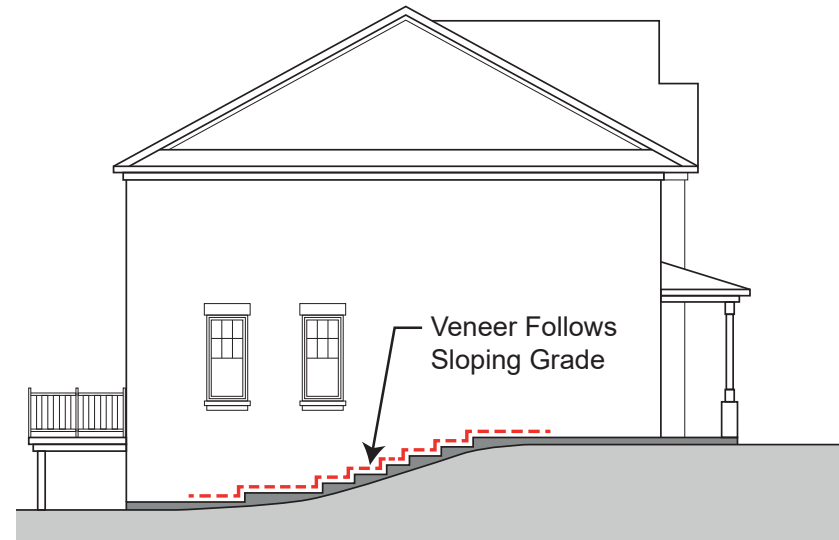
Veneer should be stepped to follow sloping grade to limit exposure of the foundation wall
